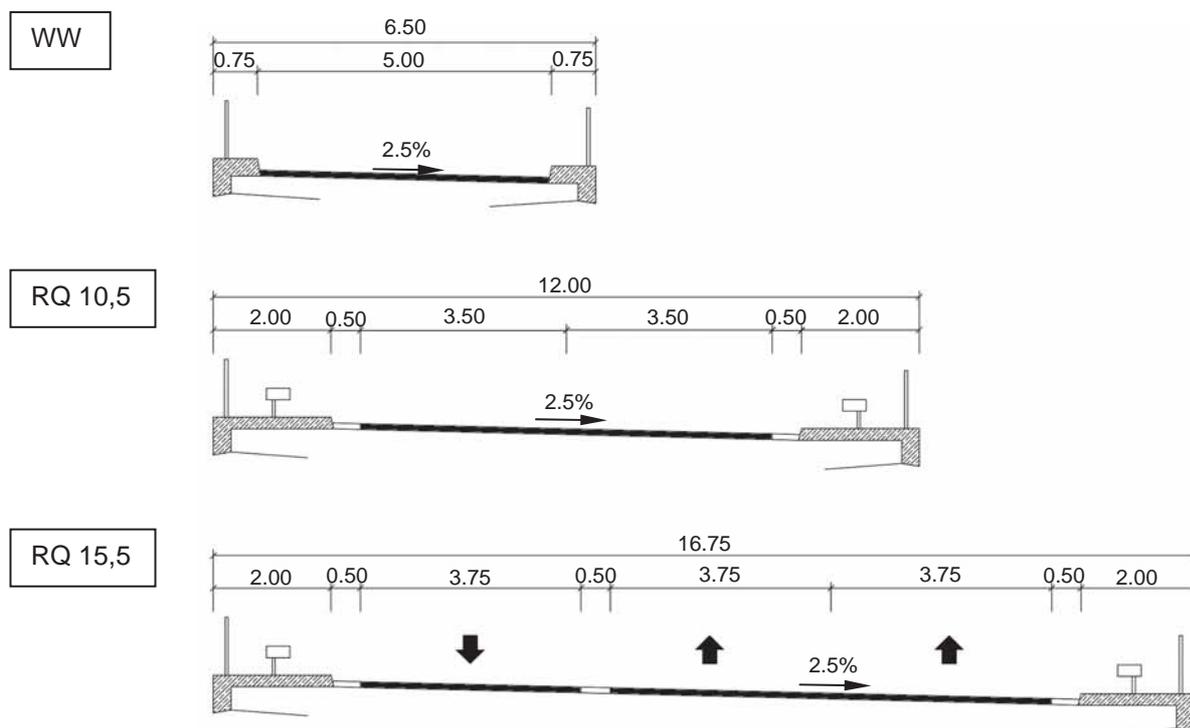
Typical layout of composite bridges with prefabricated slabs. Only slab system based on [71] is shown. Dimensions in [m].
